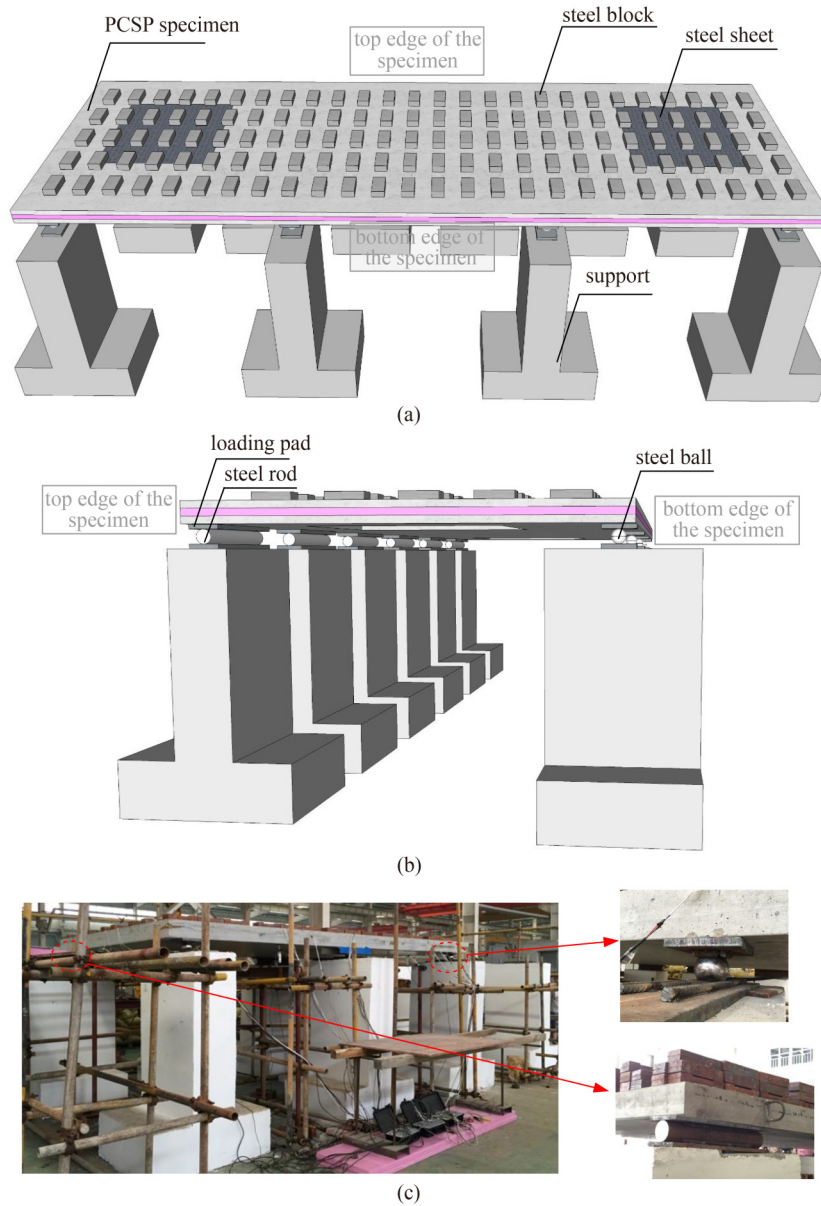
Details of the flexural test setup: (a) details of the test setup; (b) boundary condition of the flexural test specimen; (c) photo of the test setup.
